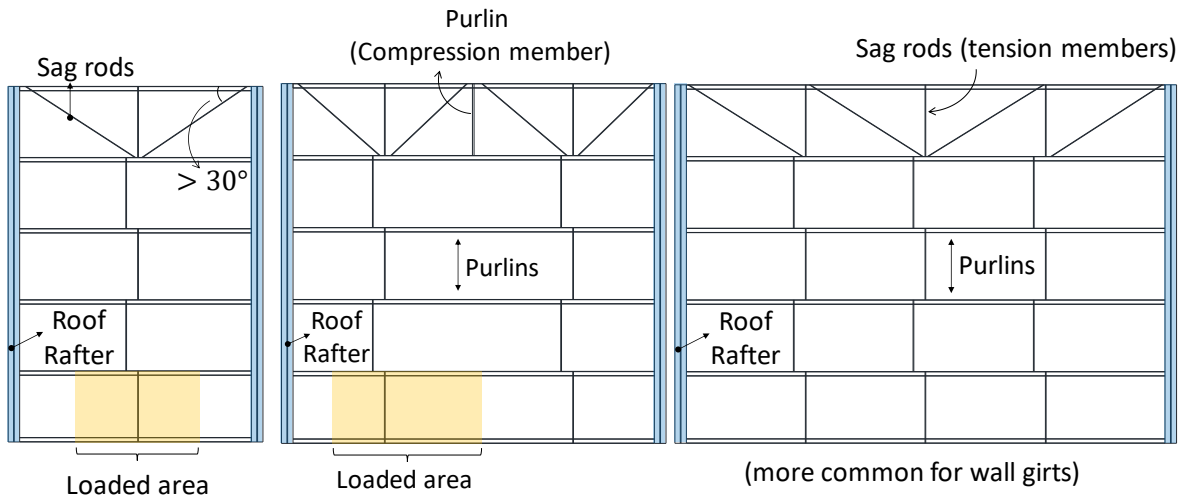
Suggest configurations for single eave roof (can be applied for wall girts)
